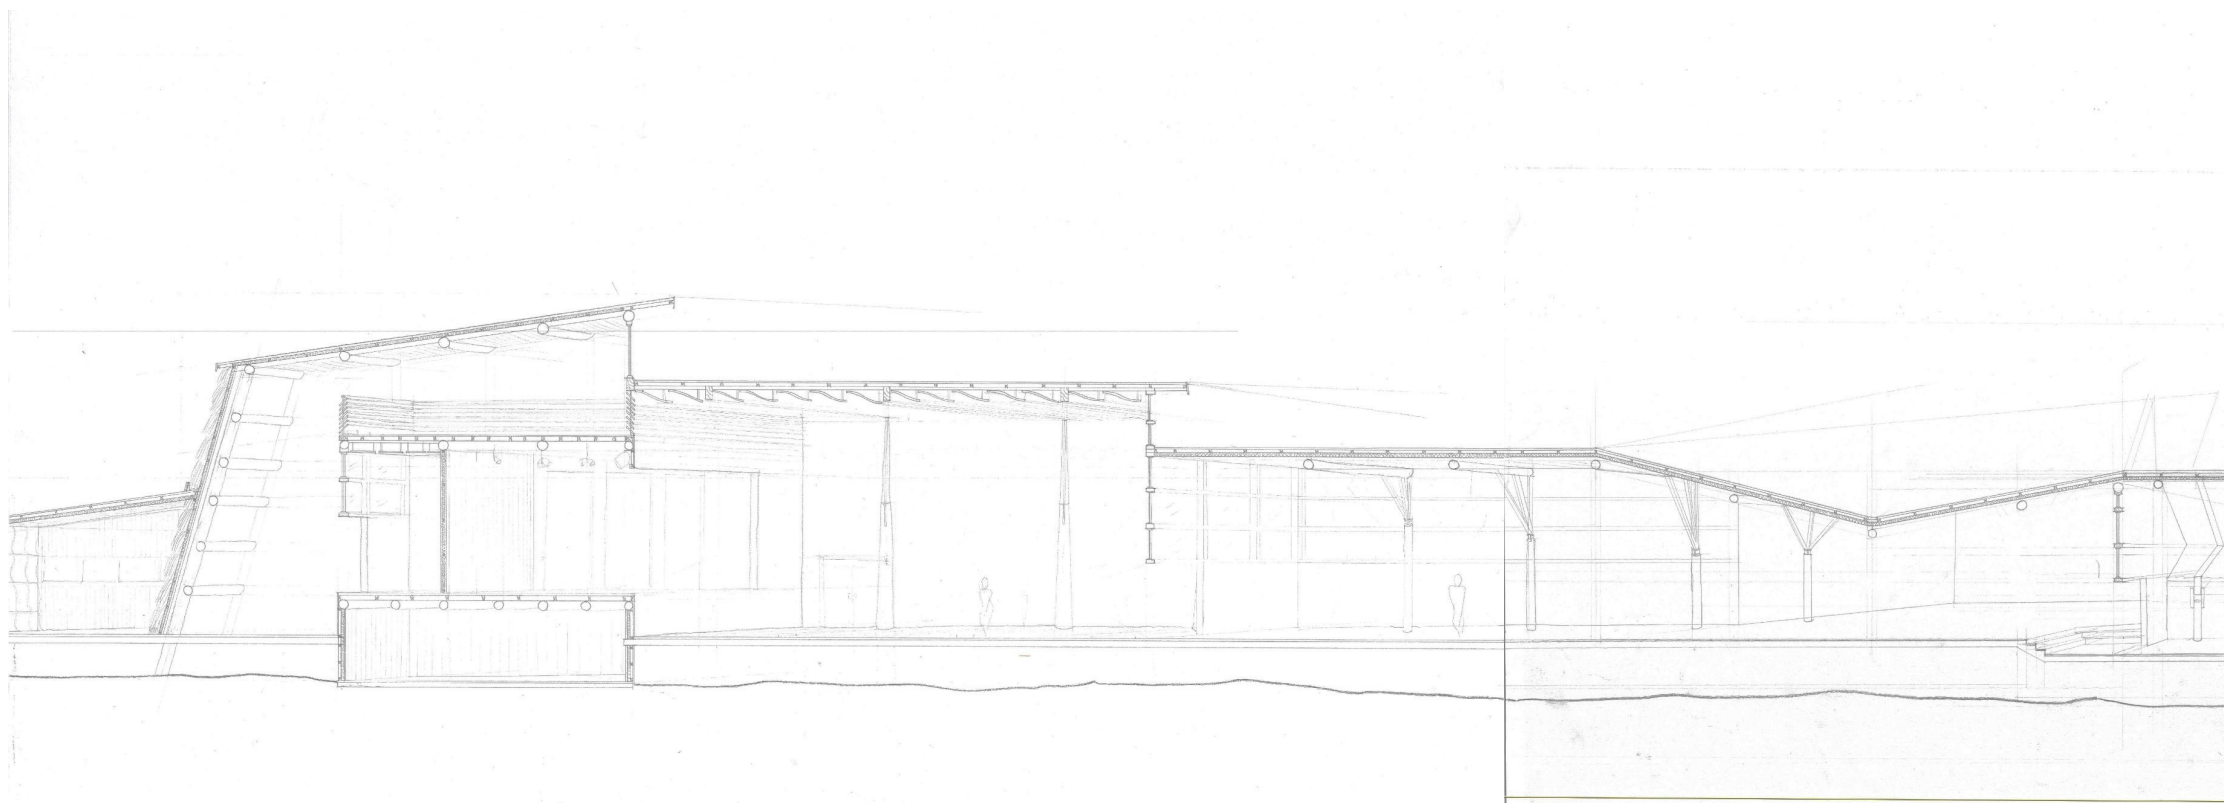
Section B-B on Prelim Plan (Author, 2021).
